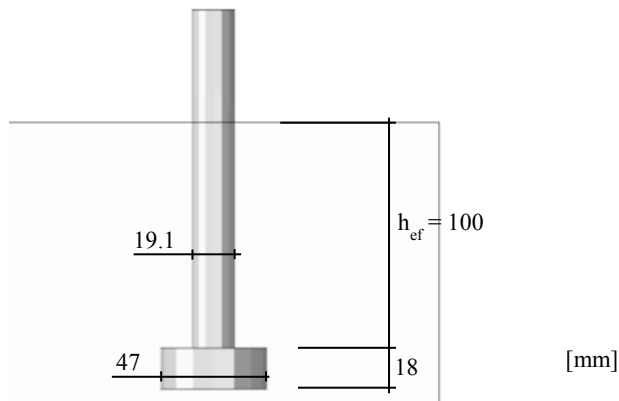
Dimensions of cast-in headed anchor bolt.
